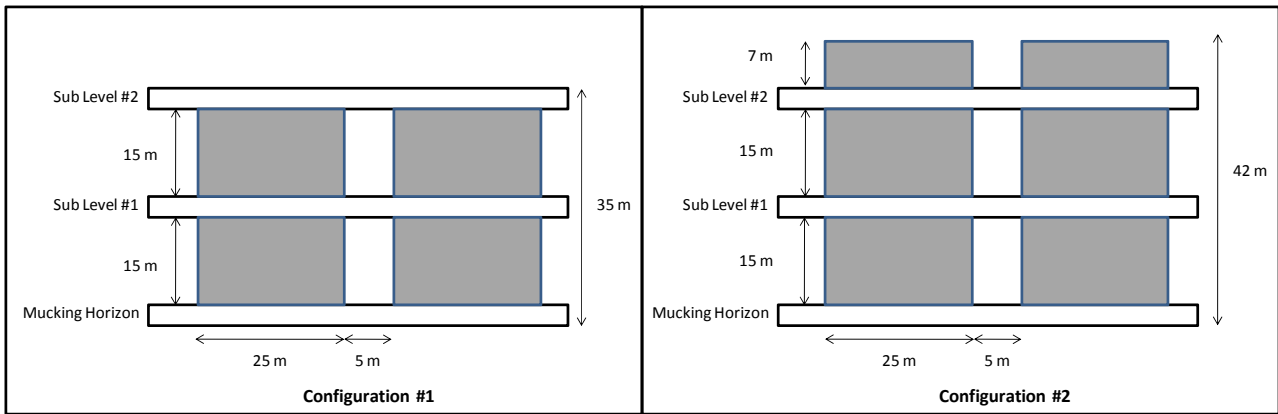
Proposed Long-hole Stope Configurations for Croinor Mine (longitudinal section).
